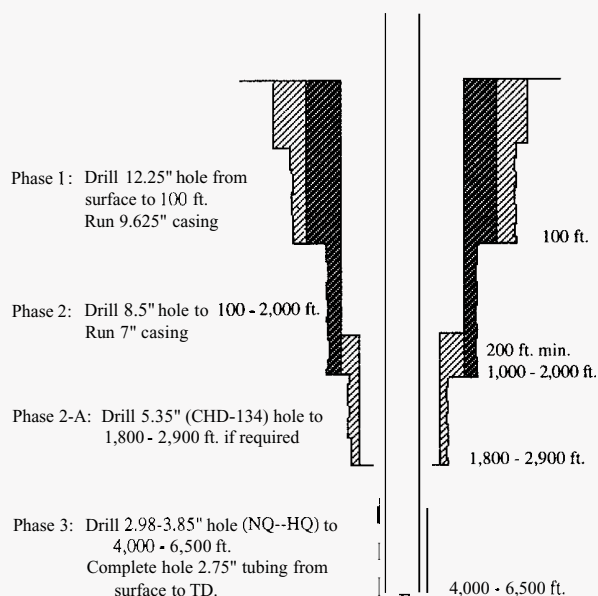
SOH-1 and SOH-2 Revised Casing Plan.
